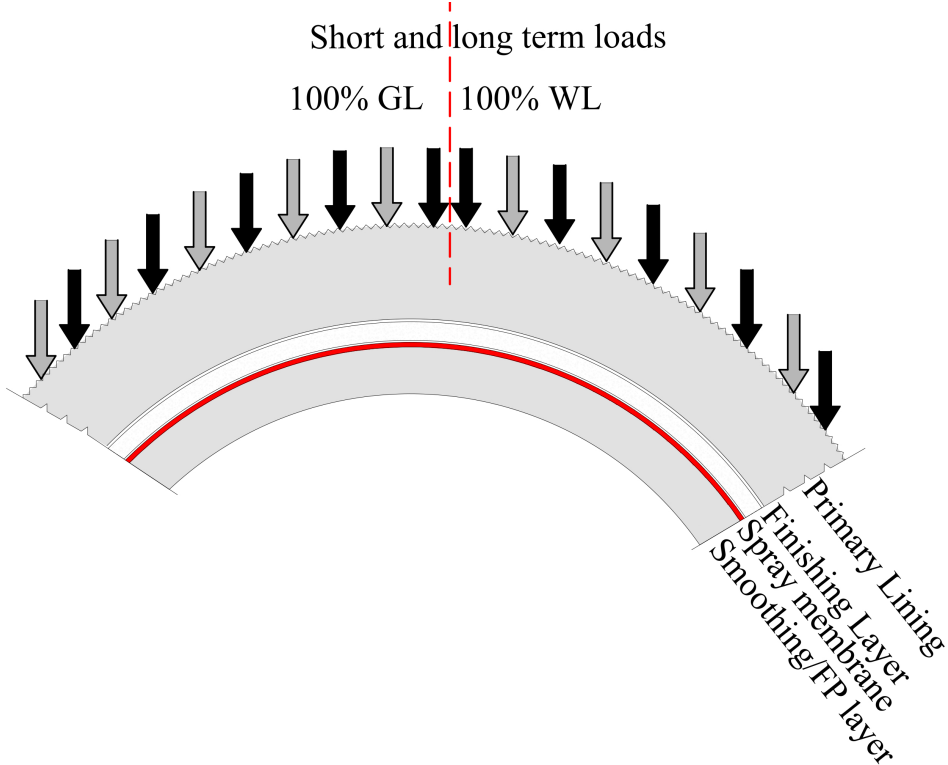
Typical cross-section and loading configuration of a modified composite shell lining (secondary lining non-structural).
